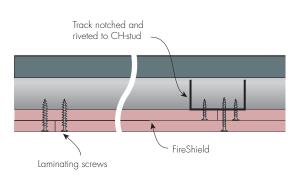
Horizontal Shaft Wall Non-Trafficable Ceiling to Masonry Wall
